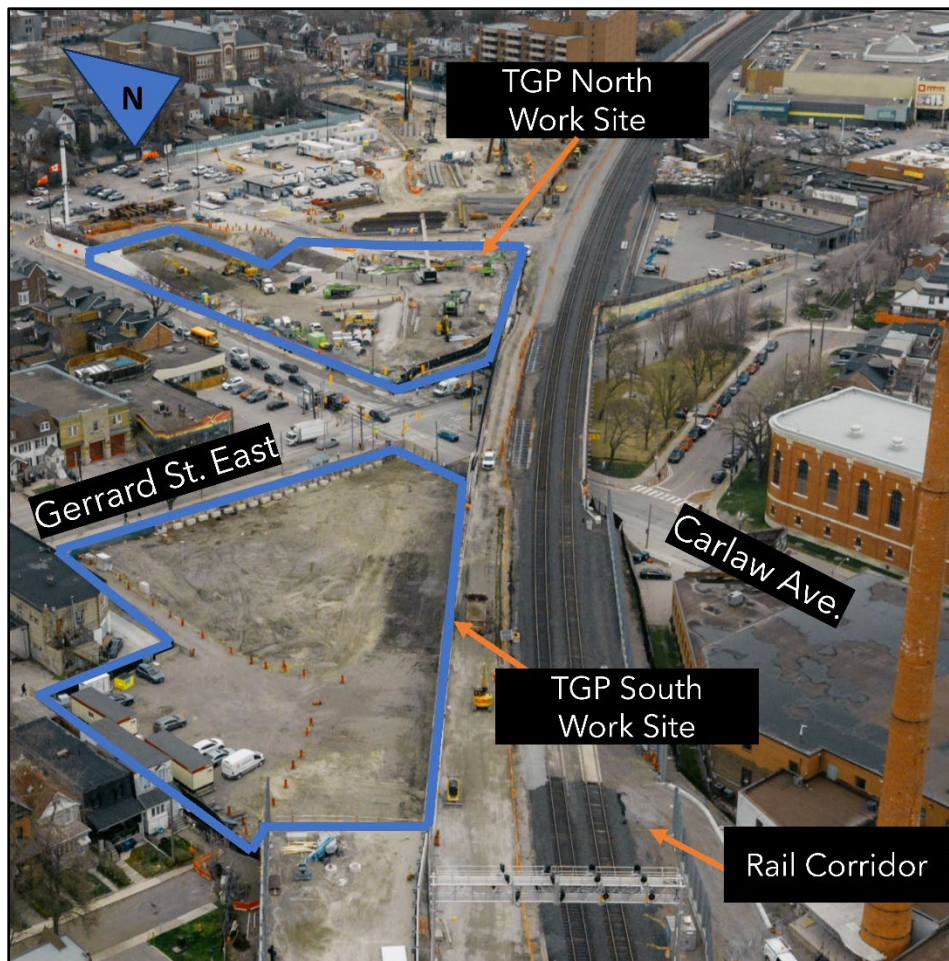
Ontario Line Gerrard Station Construction Site Source: Metrolinx
